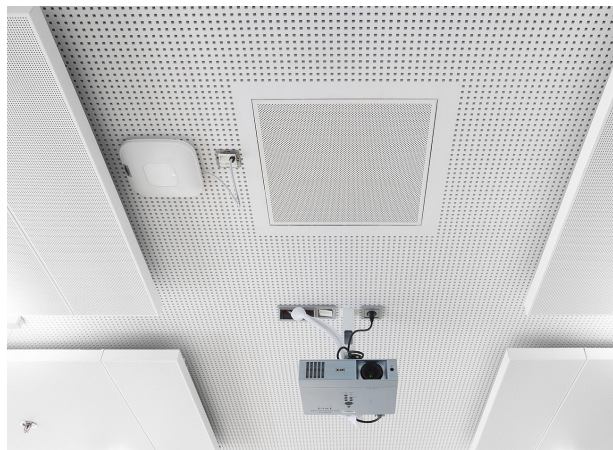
Opticlean installed in a perforated gypsum plasterboard ceiling
